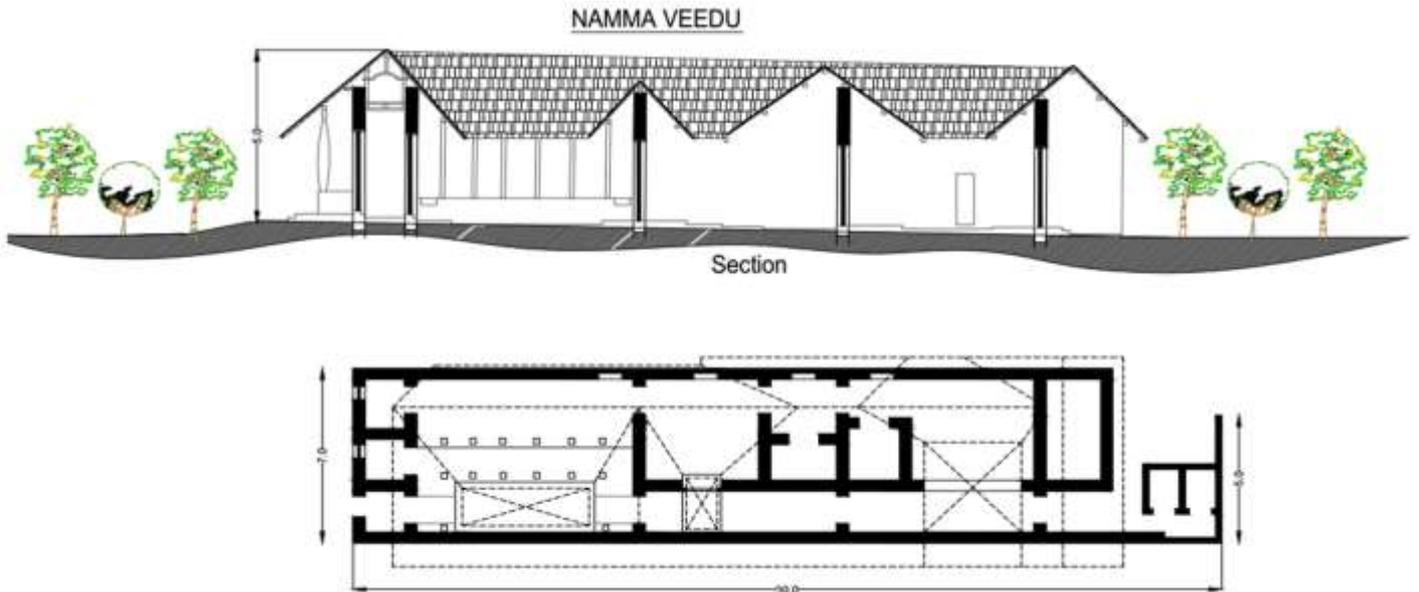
PLAN AND SECTION SHOWING THE VARIOUS SPACES
